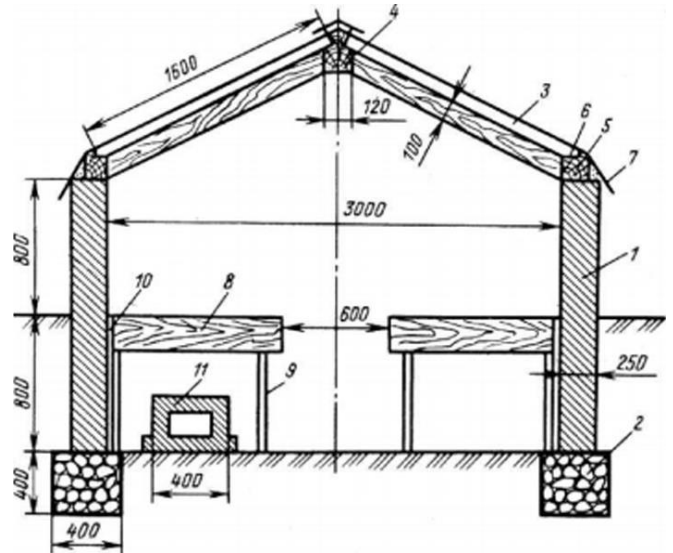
Winter gable greenhouse. 1-wall; 2-foundation; 3-rafters; 4-ridge bar; 5-wrap timber; 6-groove for the stop frame; 7-low tide; 8-rack; 9-rack; 10-the gap between the wall and the rack; 11-chimney
